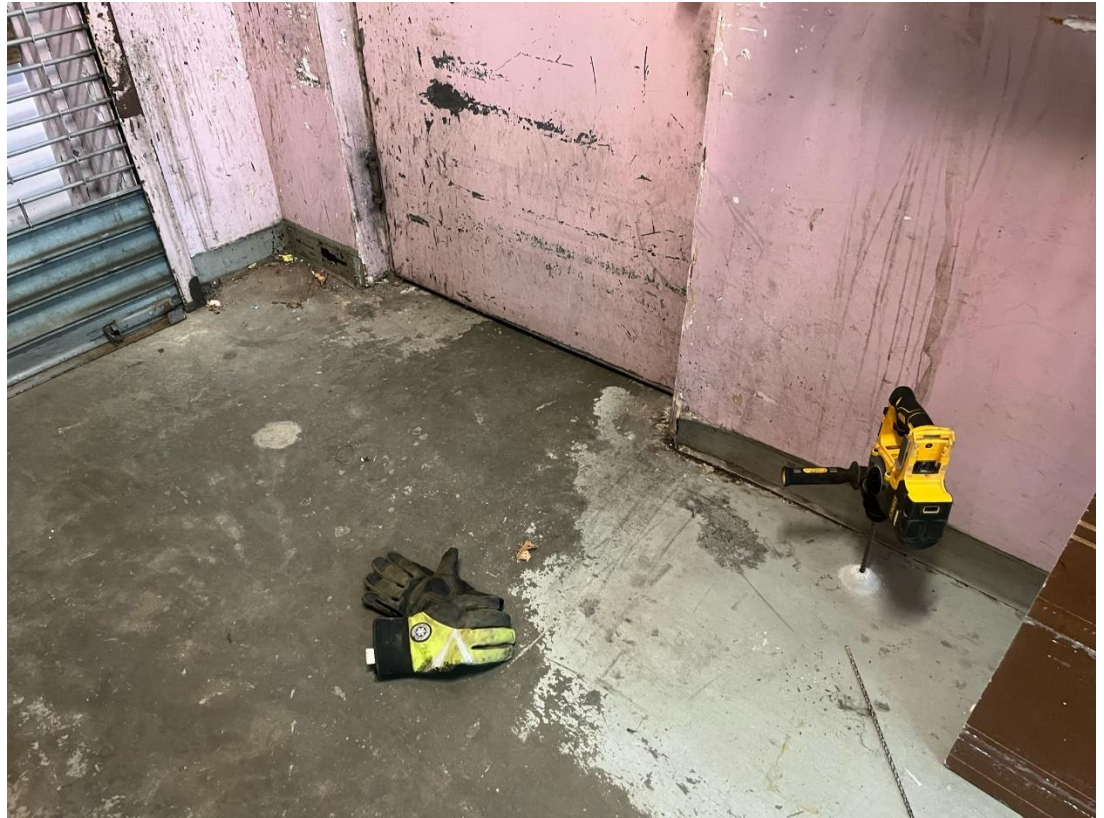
View of Pennington drilling to install a vacuum gauge and sample port on VEP-2 in Carvel, facing northwest.
